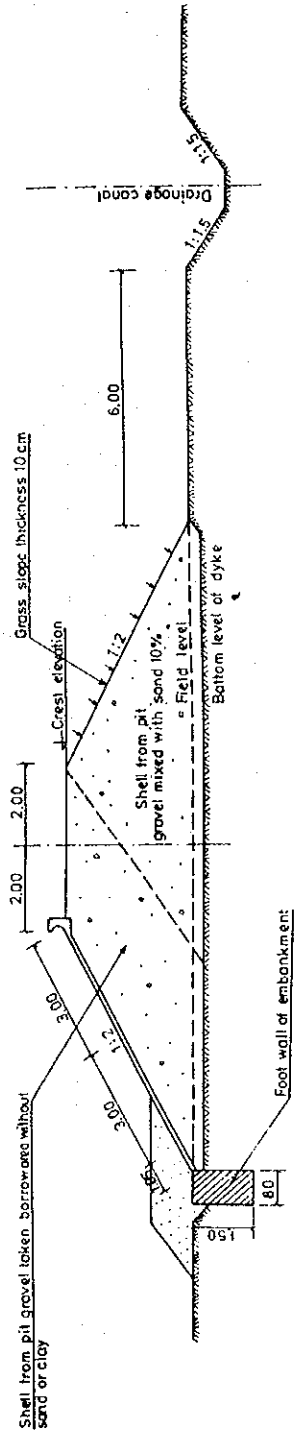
A2 Typical Section of Calimanesti Dam
